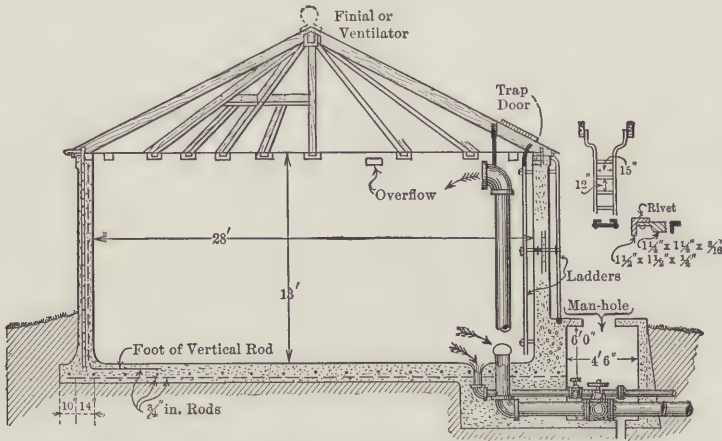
60000 GALLON CONCRETE RESERVOIR—SECTIONAL ELEVATION
